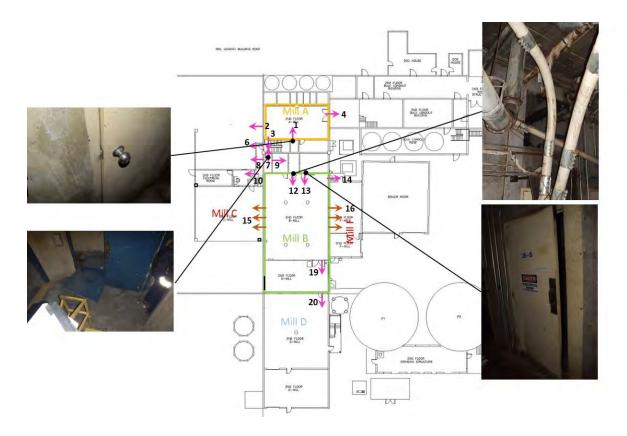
Mill A and Mill B Level 2 Exemplar Directional Indicators
